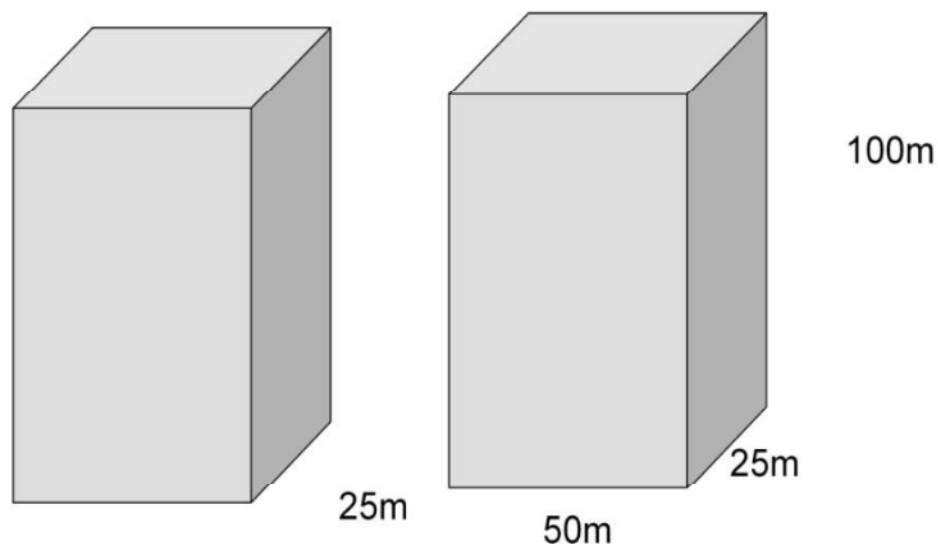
The hypothetical reference building layout proposed at APEC-WW 2007 in China.
